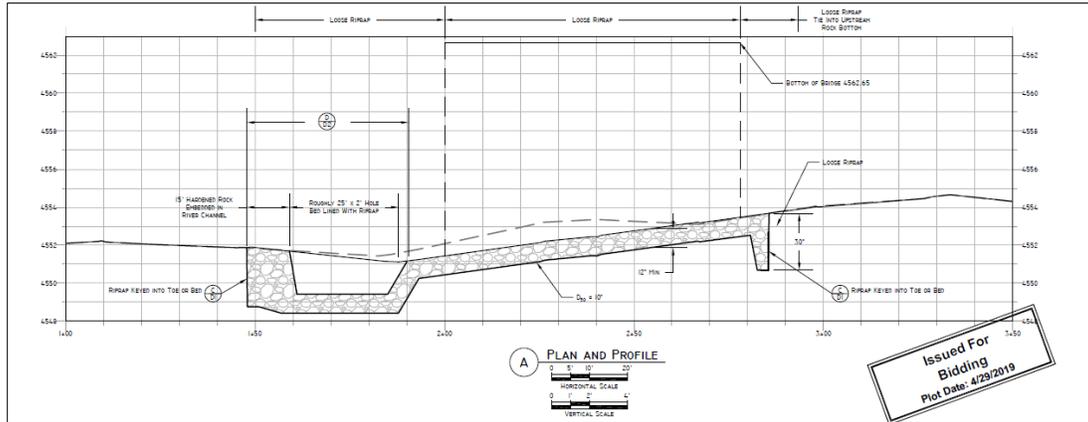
is a cross section showing the work that will be done beneath the existing bridge. The concrete rubble and debris will be removed, the footings reinforced, and the channel shaped to coincide with the upstream and downstream energy lines and flow patterns. The channel is armored with engineered rip rap.
